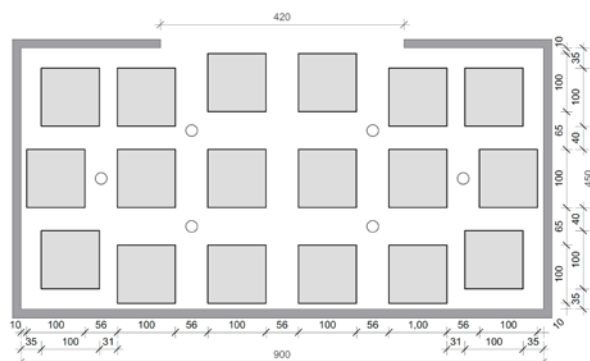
Floor plan with arrangement of the 18 wooden cribs and the six thermocouple trees (circle) for test V3 [in cm]
